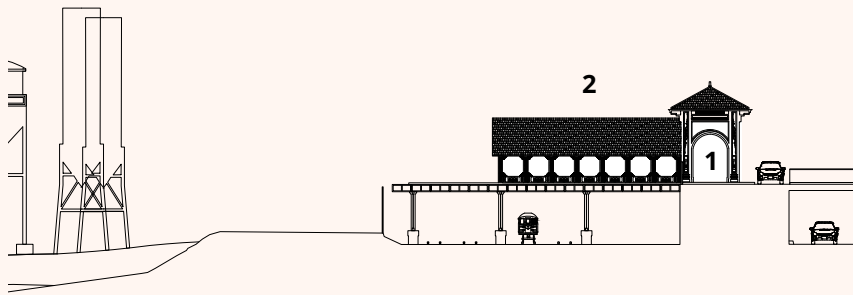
Section from Cass Gilbert's Westchester Avenue Station Pre-Schematic Conditions Assessment
